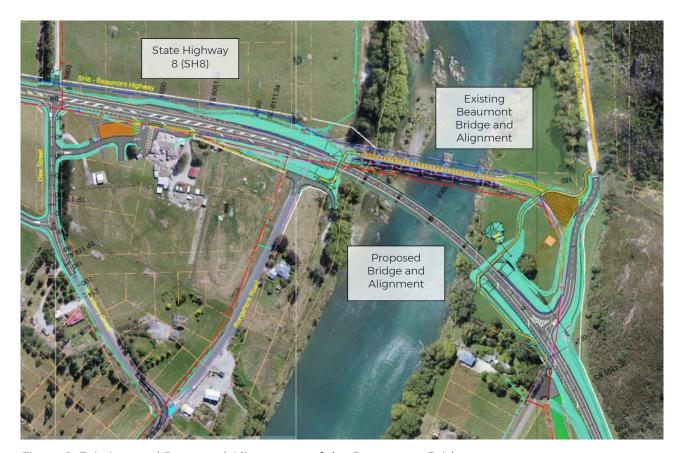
Existing and Proposed Alignments of the Beaumont Bridge
